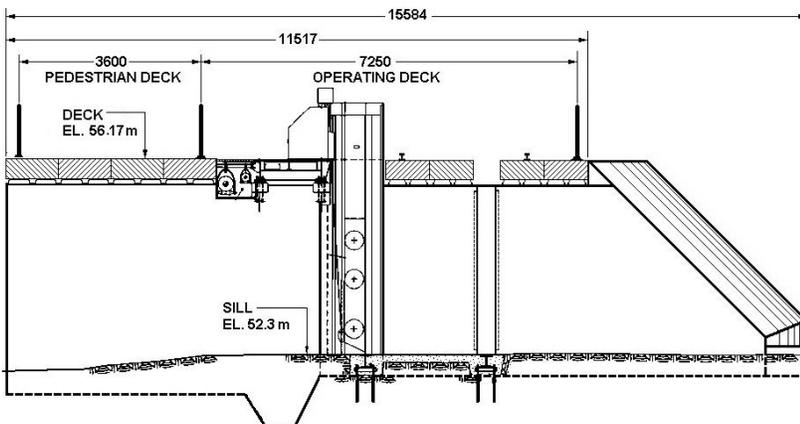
Cross section of West Dam. Dimensions in millimetres.
